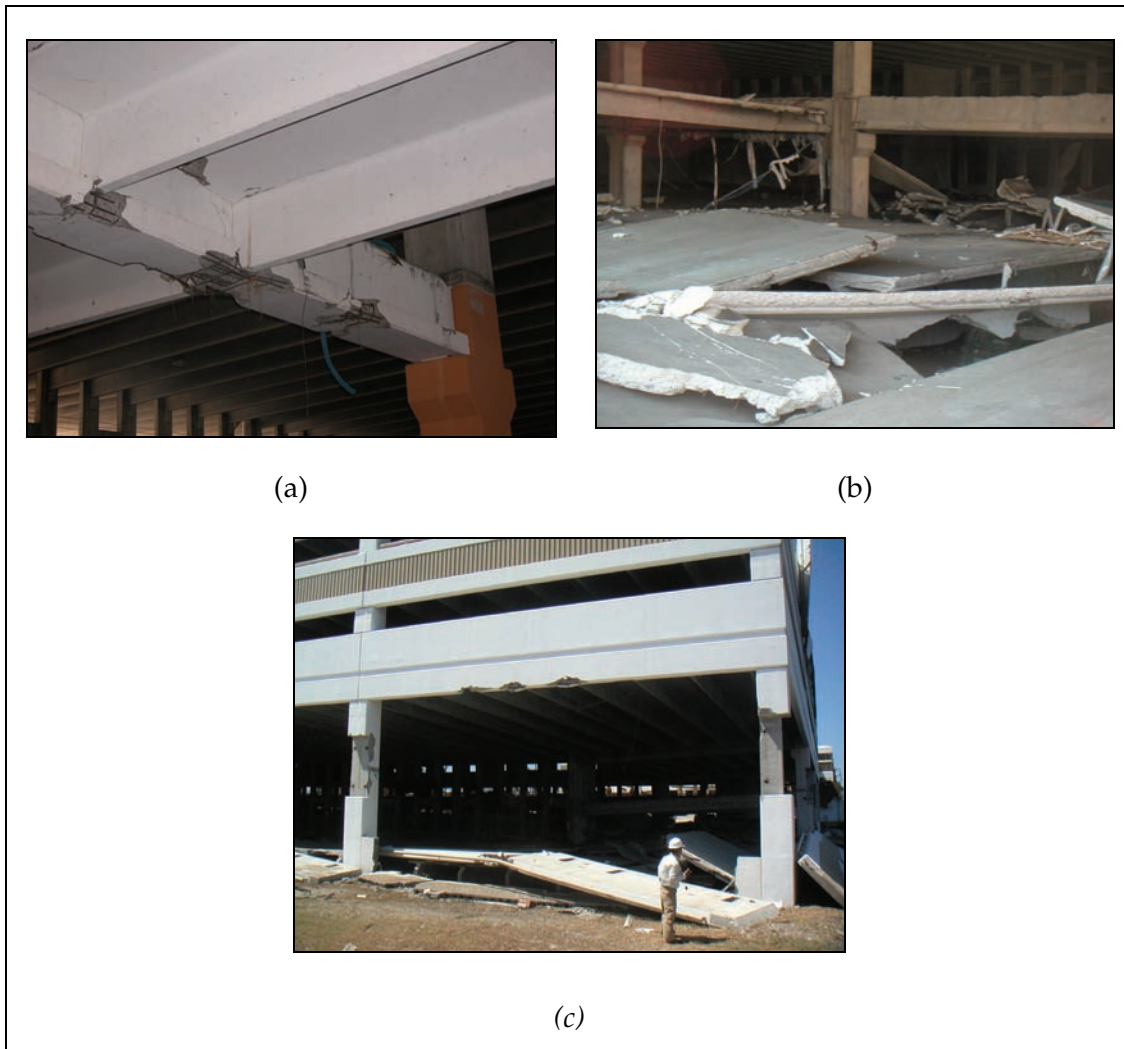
Shear failure in girders supporting deck beams.
